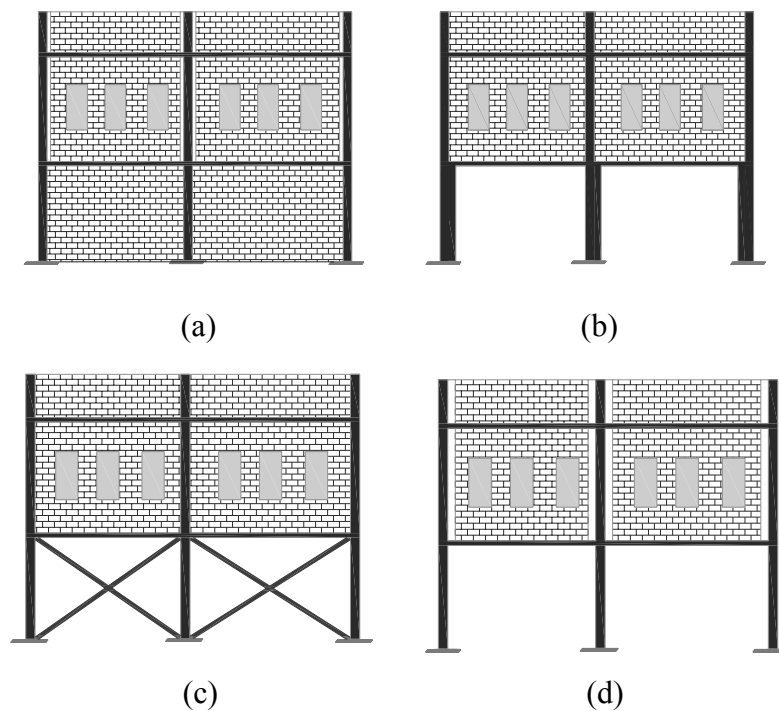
Solutions for Weak Storey: (a) Add walls, (b) Increase cross-sections of columns, (c) Add steel bars, (d) Isolation gaps
